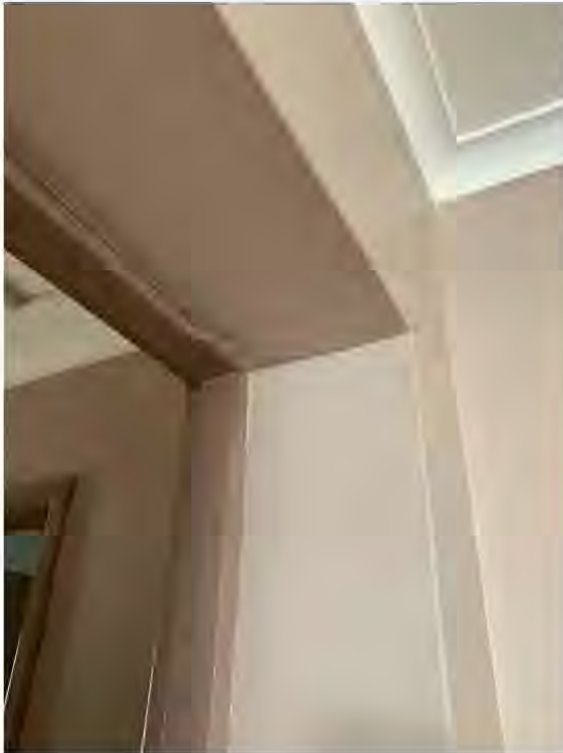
WIDTH OF ORIGINAL REAR WALL
